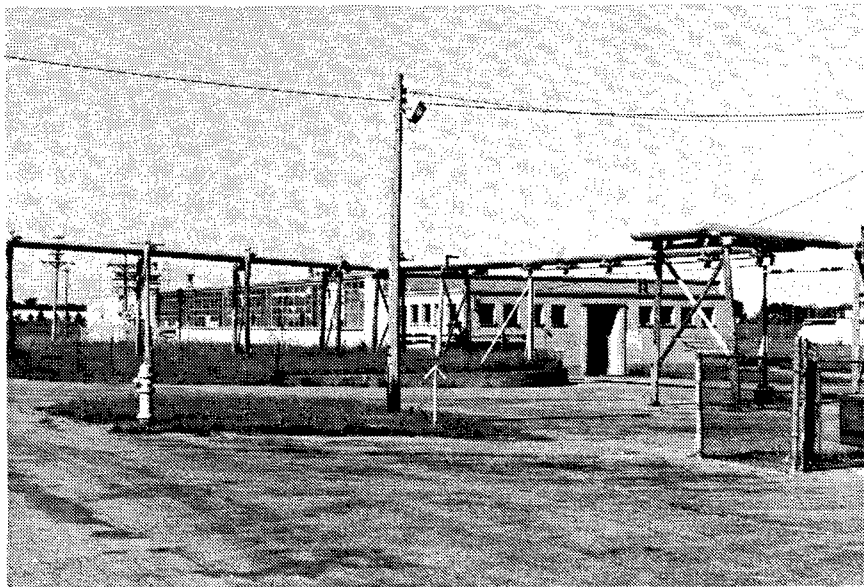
Building 111: Lead Extrusion and Swaging Building.
